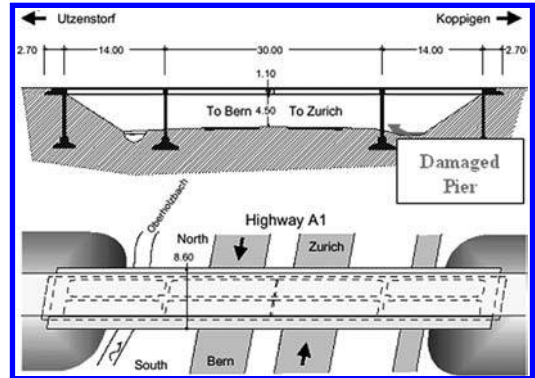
The geometry of the bridge; top and plan view (modified from the Z24 benchmark documents).
